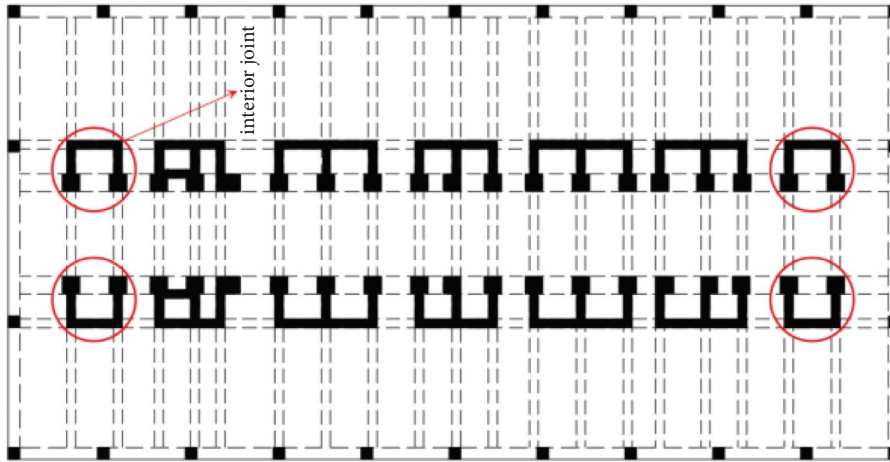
Architectural plan with a prototype U-shaped section wall.
